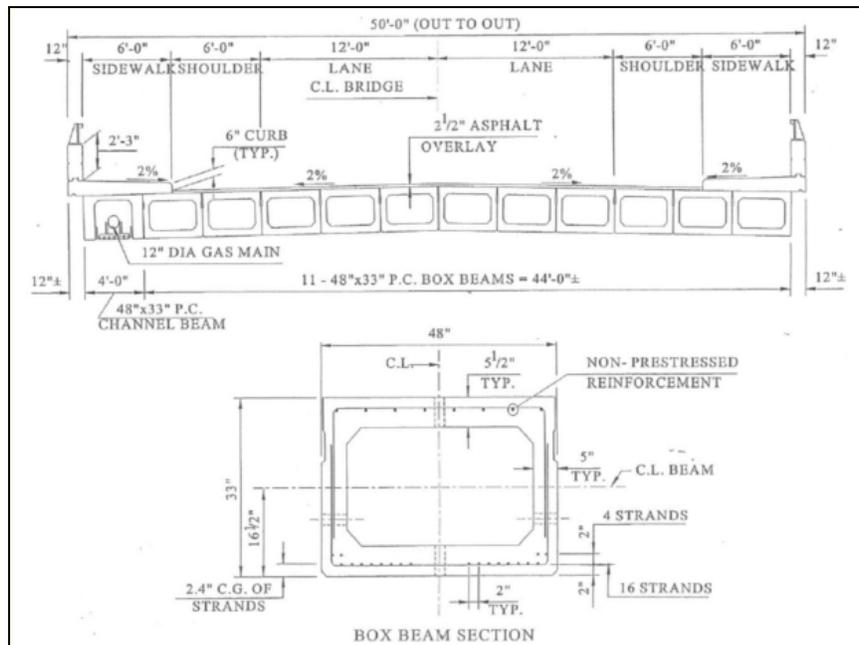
Prestressed-concrete bridge-rating example #2 cross section
